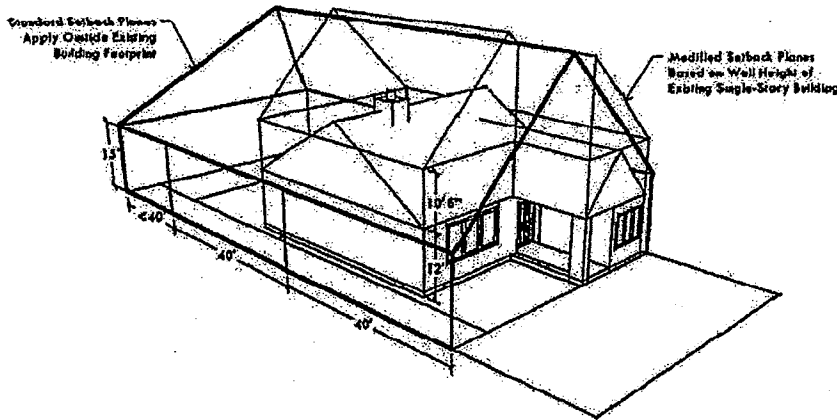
Side Setback Plane Exception for Existing Single-Story Buildings
